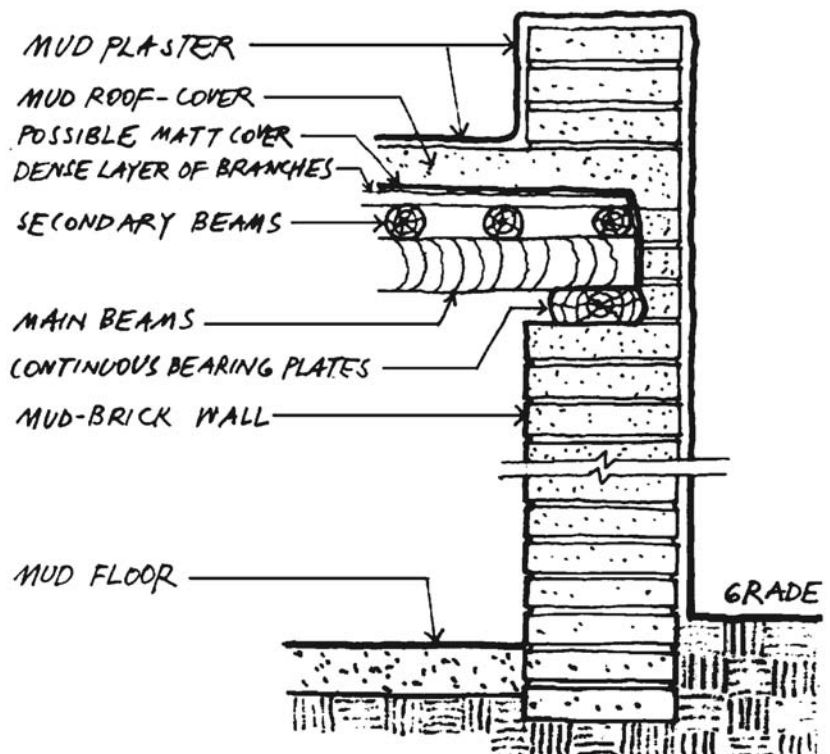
A possible arrangement of the roof beams in Building 3.
